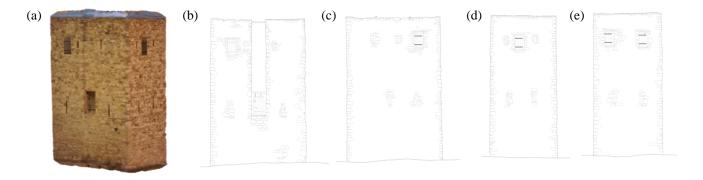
(a-e): 3D Documentation of Tower Alaminos and Tower facades
